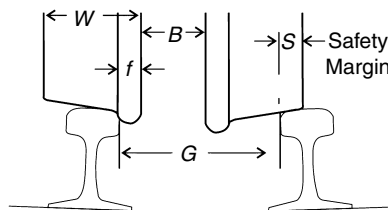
Wheel and rail geometry related to gauge widening derailment.
